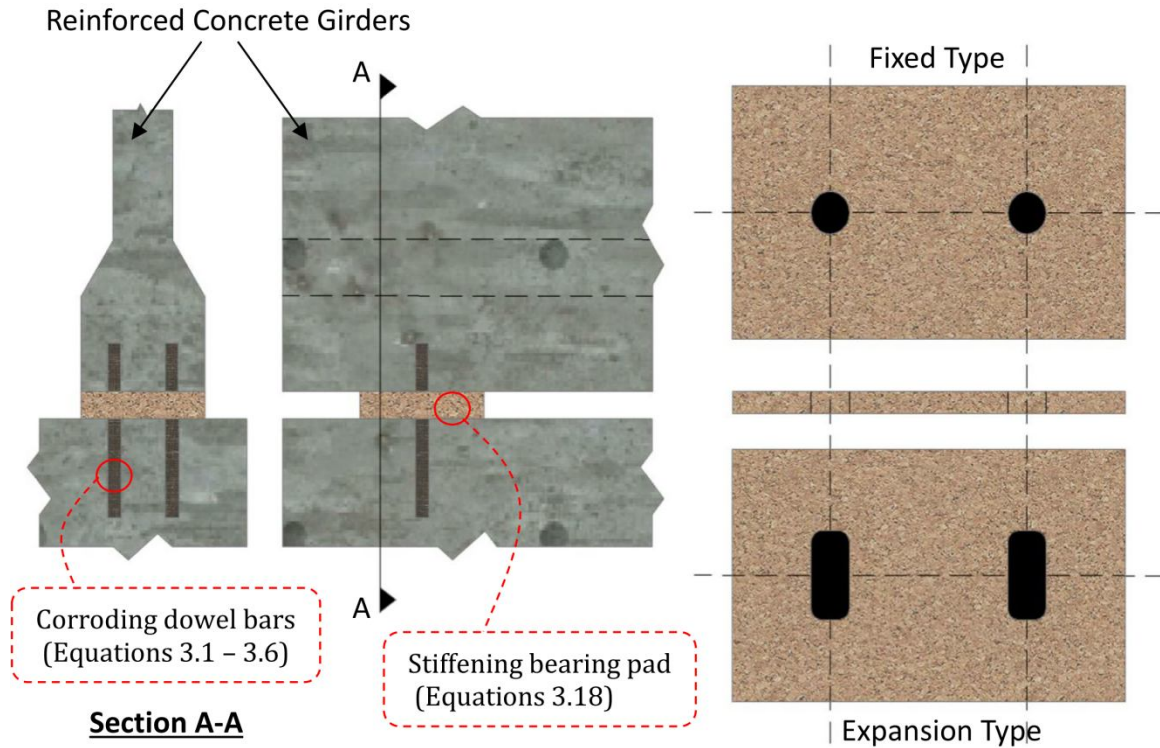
Elevation and section view of elastomeric pad bearings used for concrete bridge girders and b) fixed and expansion bearings types depending on dimensions of the slot (Ghosh and Padgett 2012).
